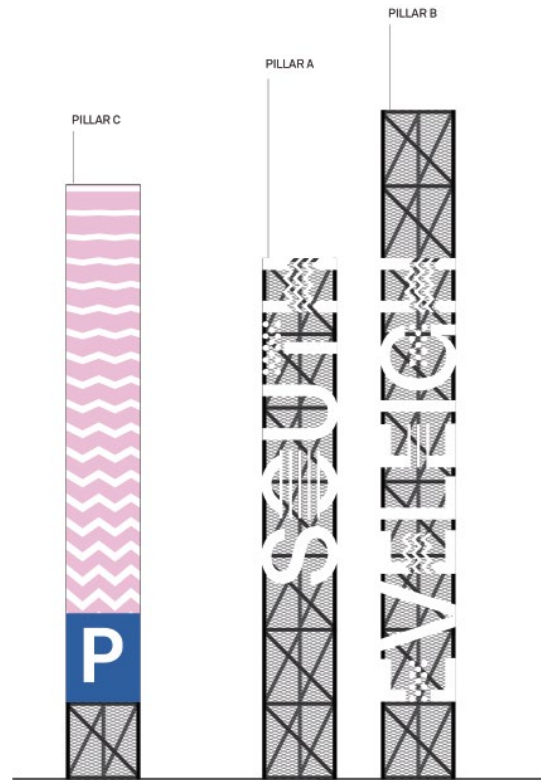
Elevation of 'Central Avenue' signage (Source: Mirvac, Diadem and Buchan, 2020)
